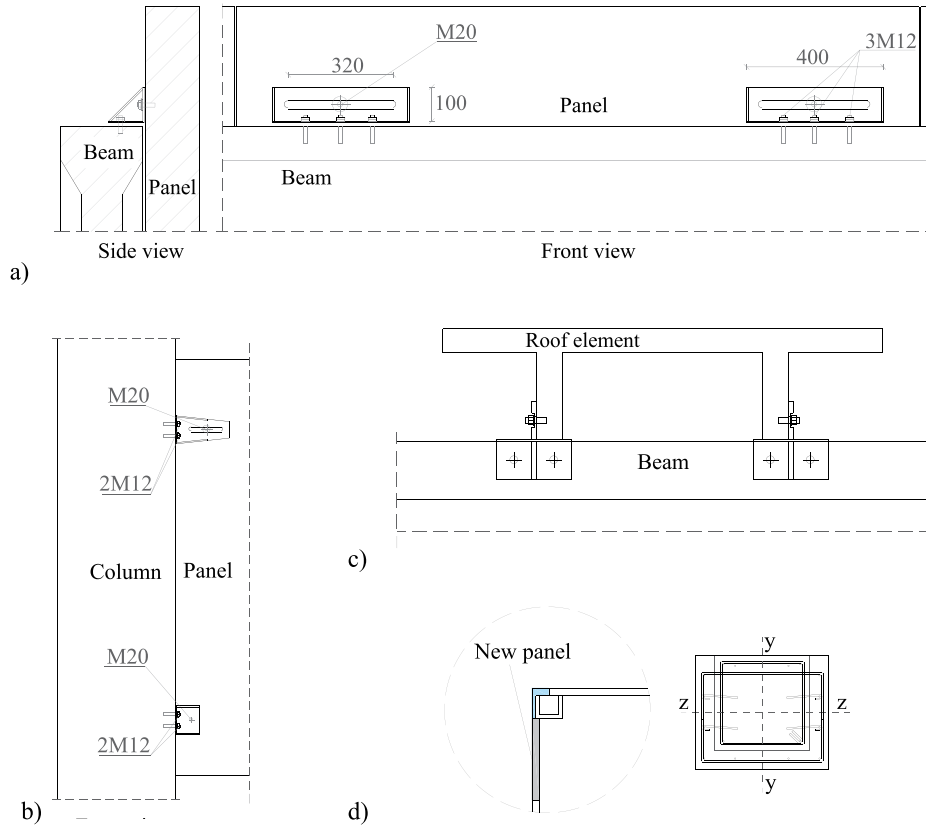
Building EE2 – schematic details of (a) vertical panel-to-column connection, (b) horizontal panel-to-column connection, (c) roof-to-beam connection, (d) column jacketing scheme and vertical end panel replacement. Note: The reported dimensions are in mm; S275 steel and 8.8 grade bolts were adopted.
